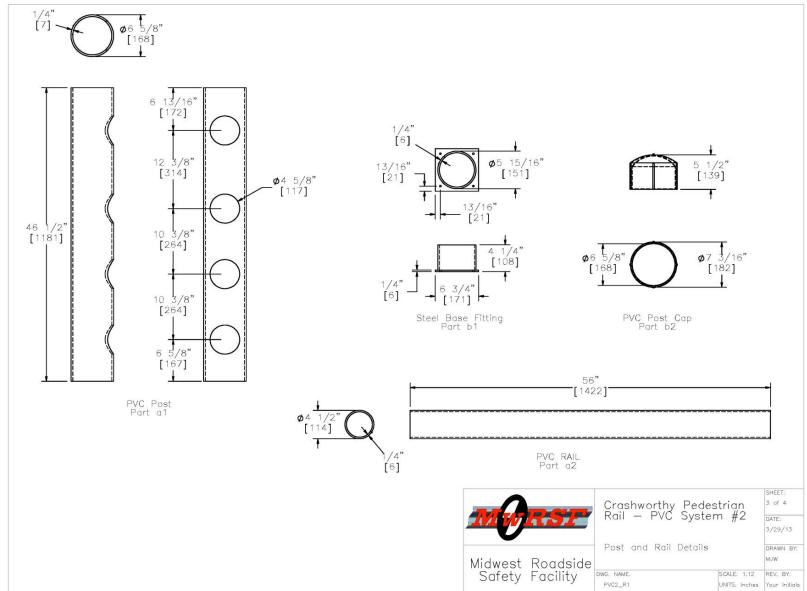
Modular PVC Rail, Design Concept PVC2-a (Sheet 2 of 4)
